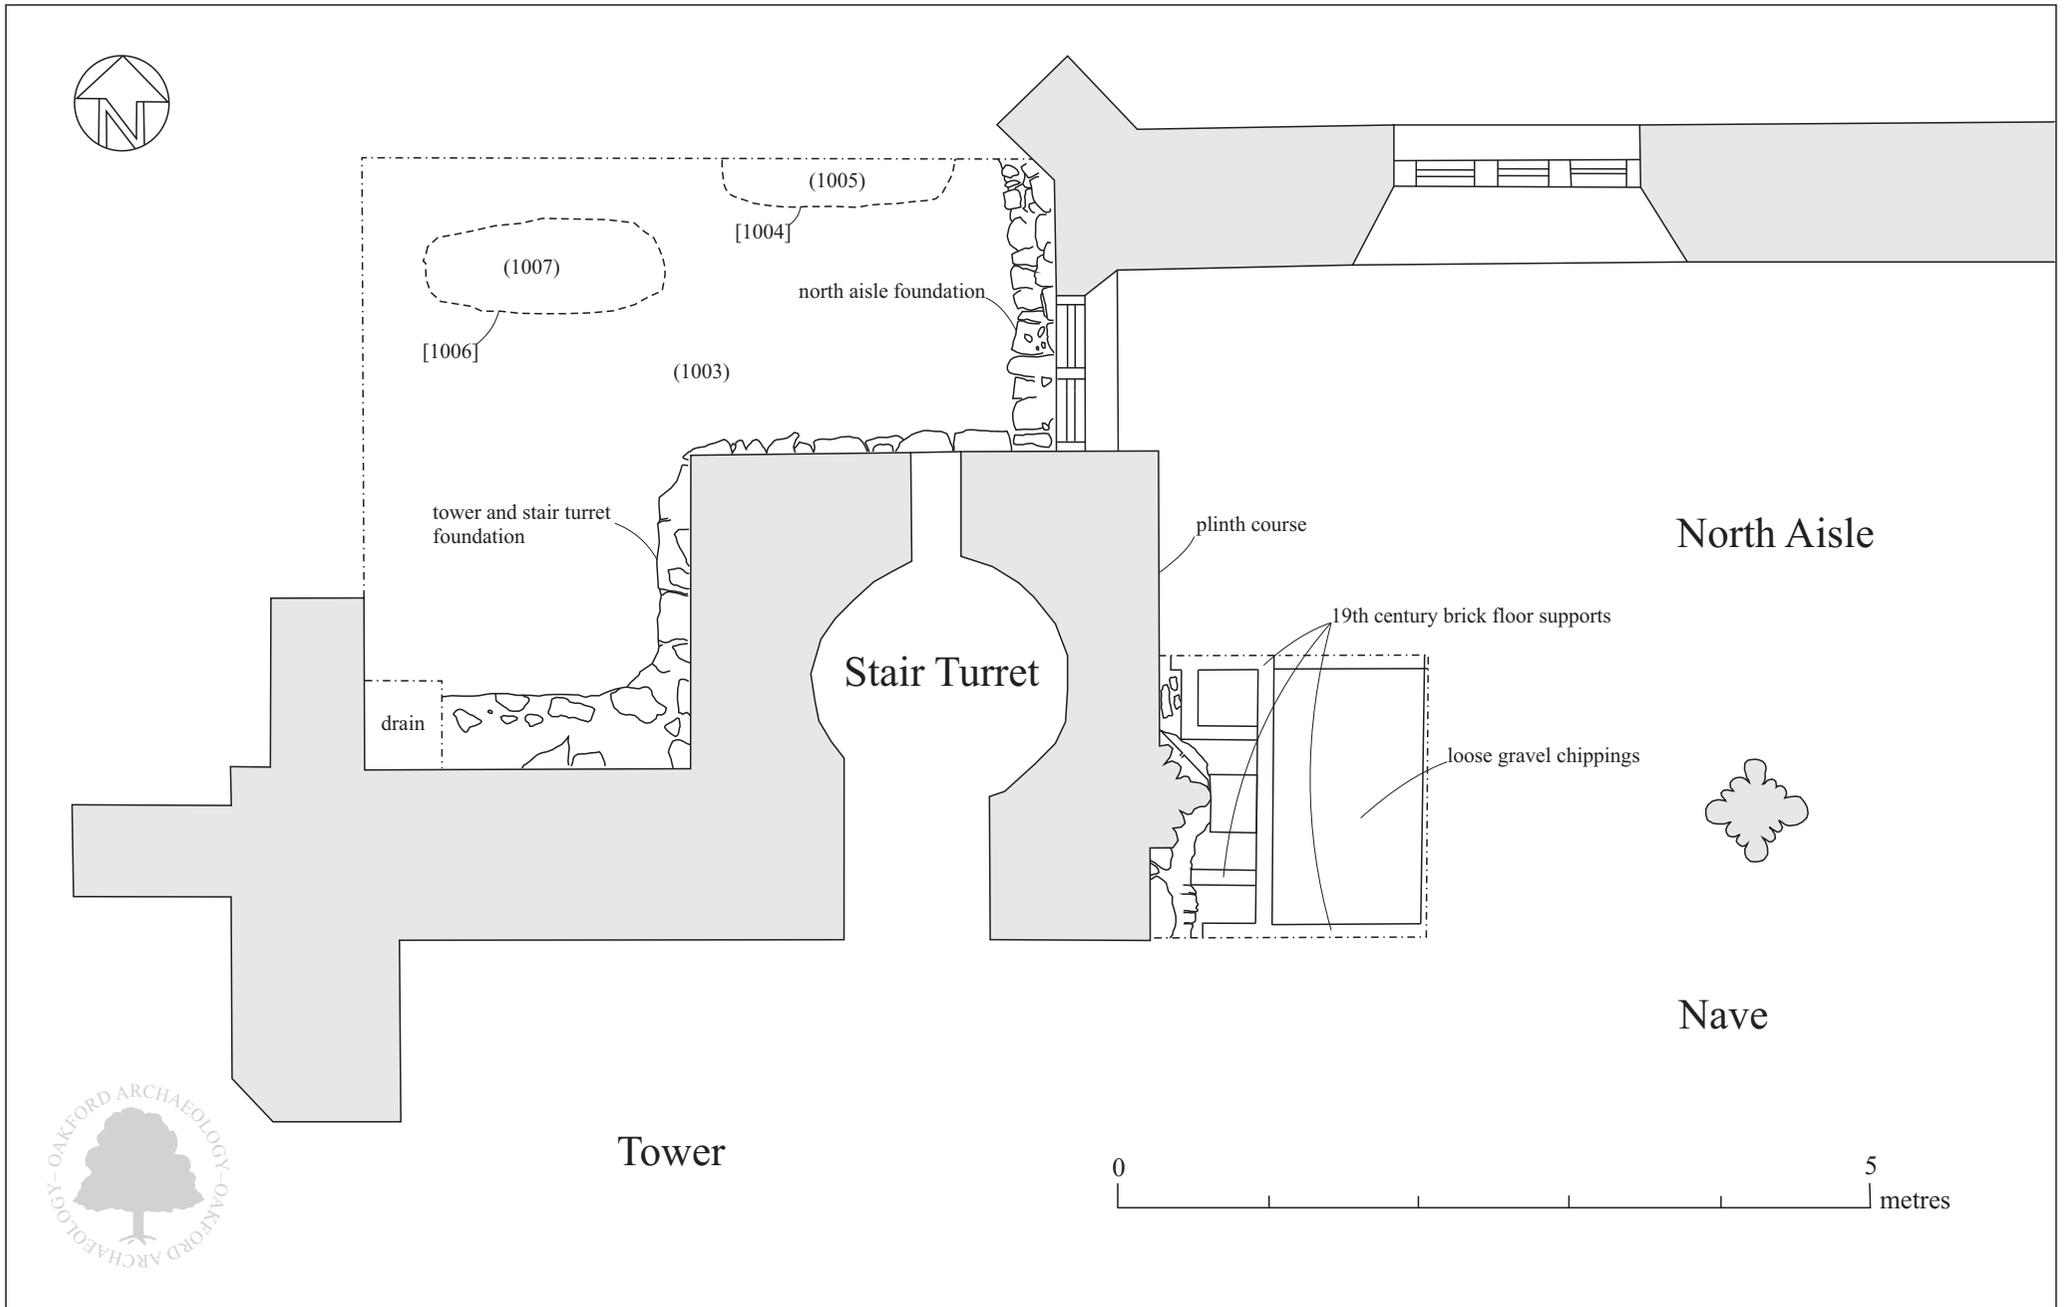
Plan of Church tower and north aisle showing location of observations.
